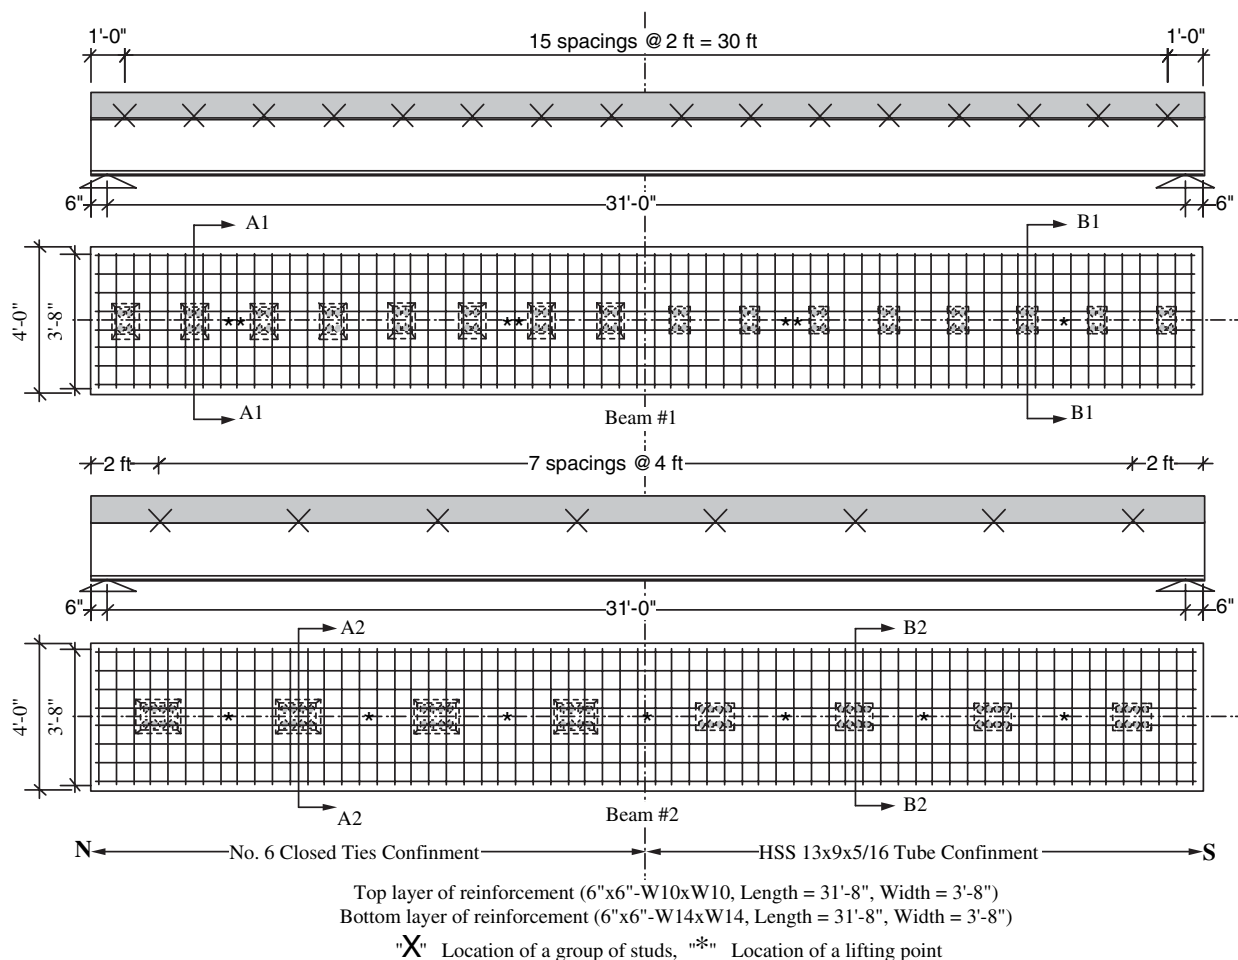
Arrangement of stud clusters of Beam 1 and Beam 2.
